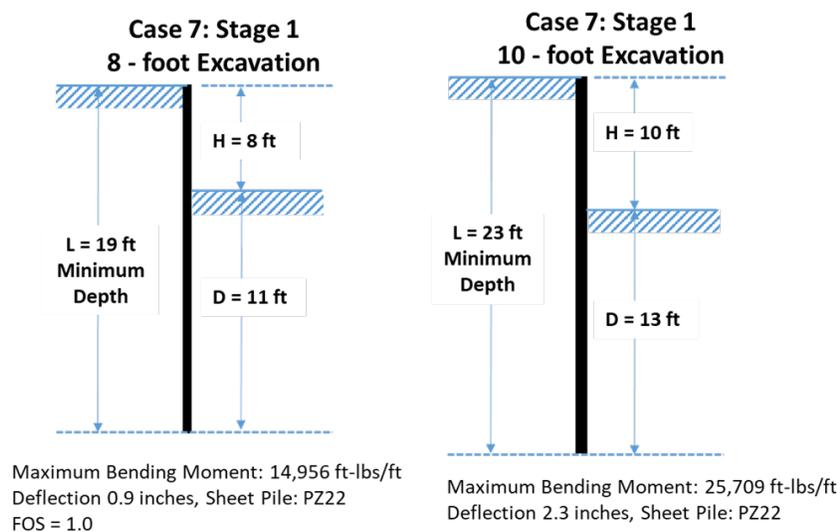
Comparison of an eight-foot excavation and a ten-foot excavation.
